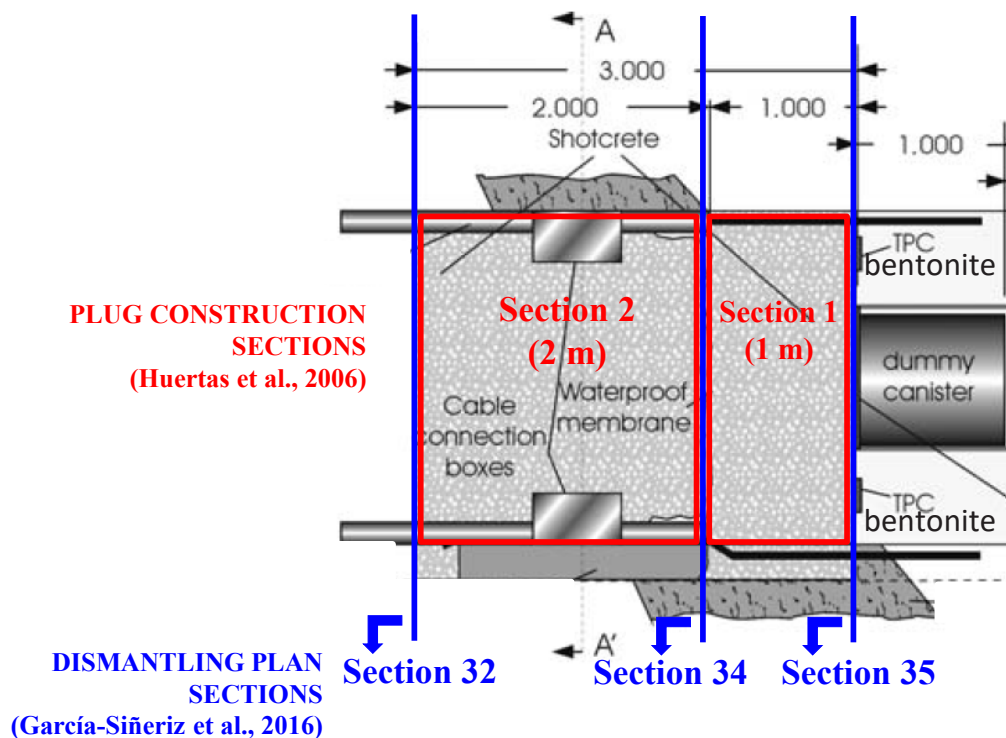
Sampling layout of the plug (modified from García-Siñeriz et al. 2016) showing the dismantling plan sections and the plug construction sections.
